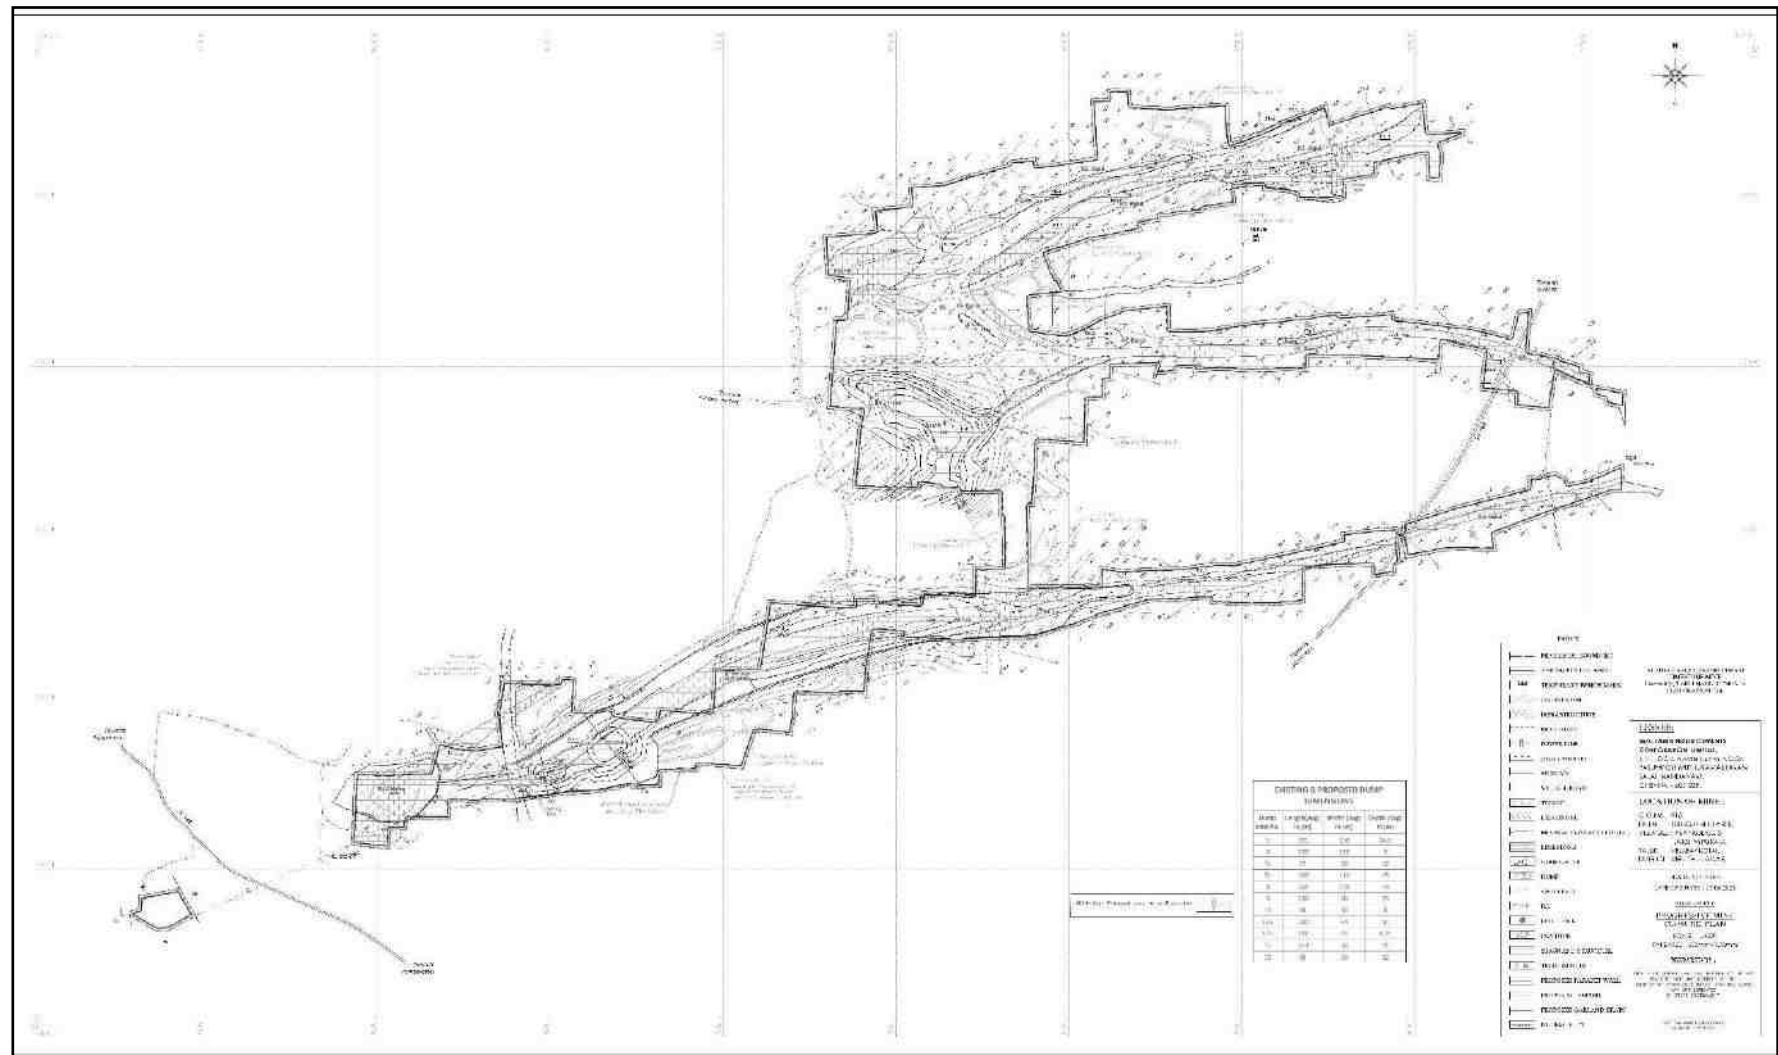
PROGRESSIVE MINE CLOSURE PLAN AND SECTIONS(2024-2025)
